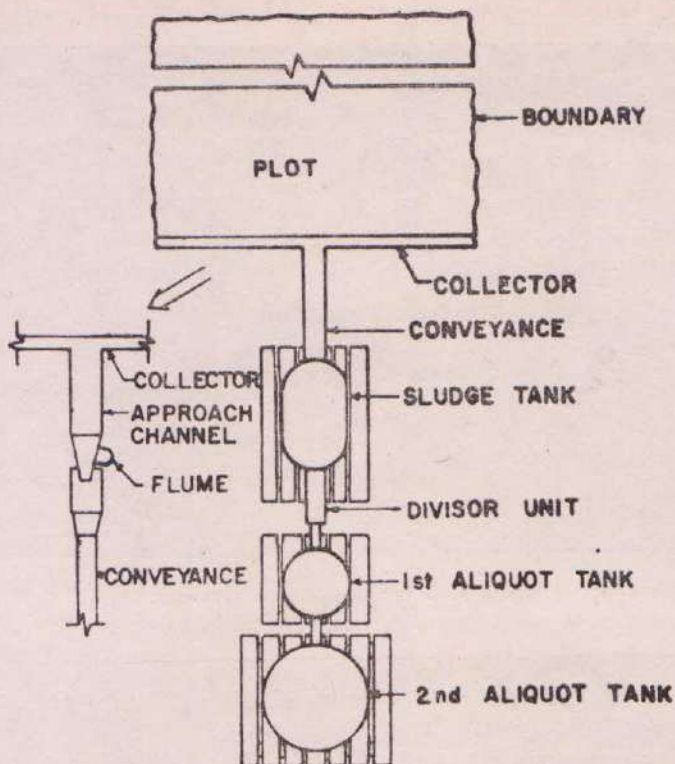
Typical plan of runoff plot equipment (after Mutchler 1963).
